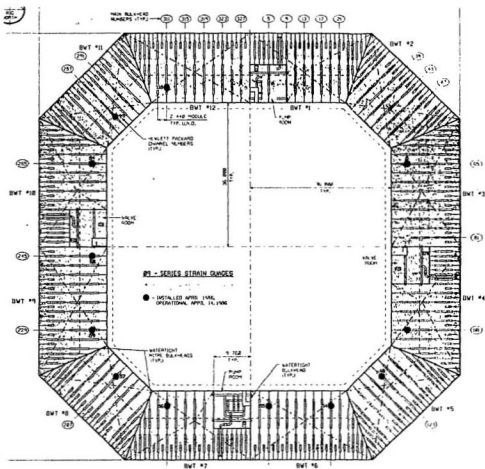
Detail of Molikpaq Rib and Bulkhead Spacing
